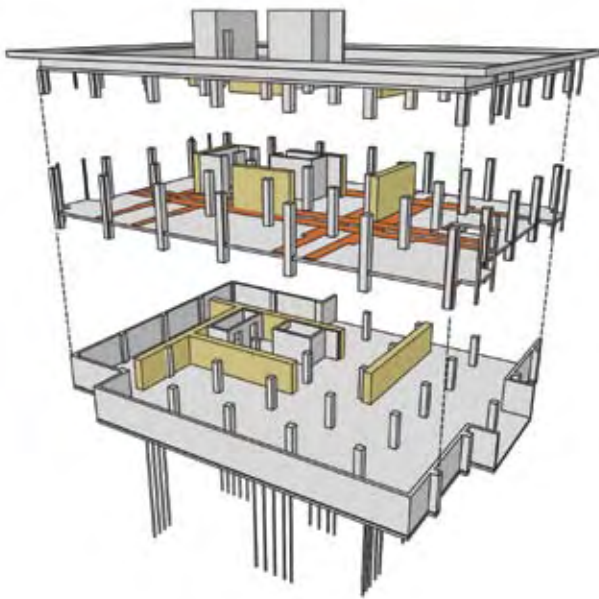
Cutaway view of the building showing the shearwall and collector element arrangement at the 4th floor and the extended shearwall and micropile foundation arrangement at the basement level
